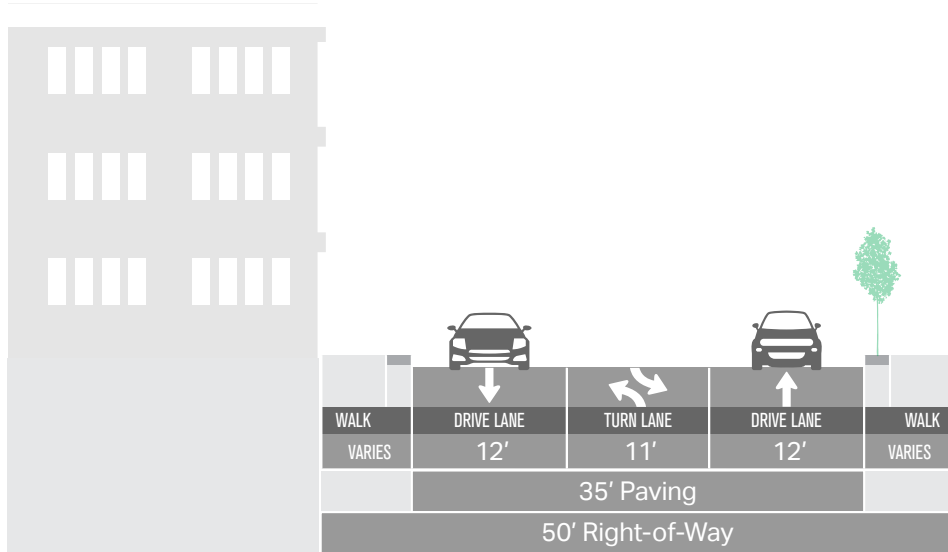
Existing Typical Sawyer Street Section: North of Washington Avenue
